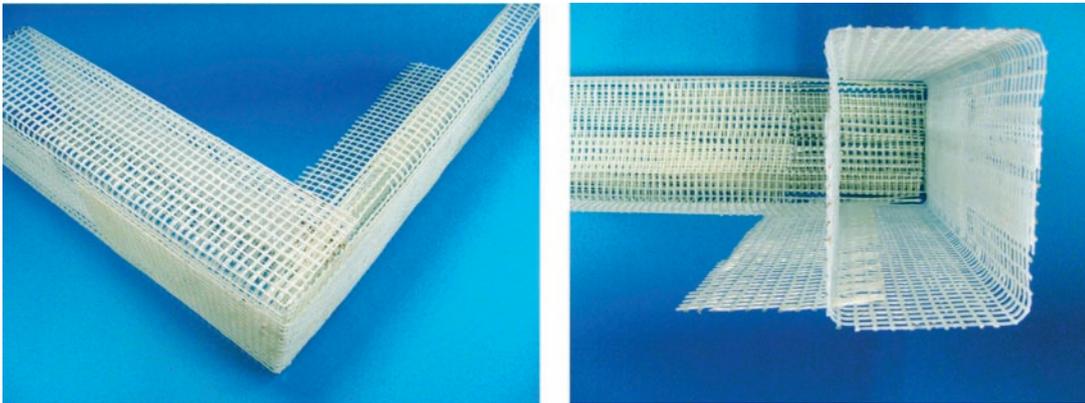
Details of tailored AR-glassfibre reinforcement for frame knees
